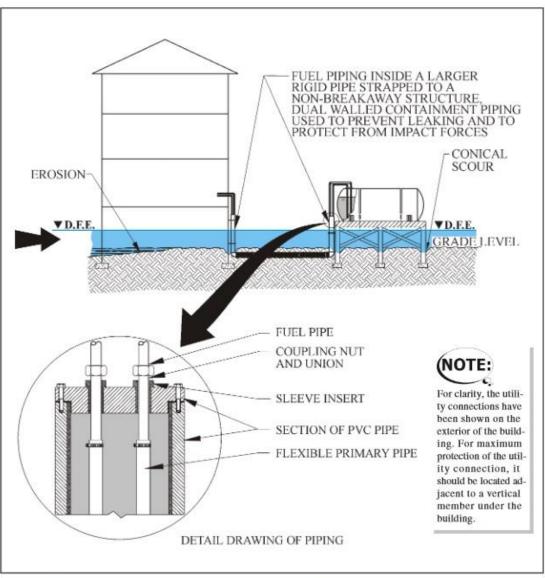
B: The vertical runs of fuel piping embedded in utility shafts strapped to non-breakaway structures
